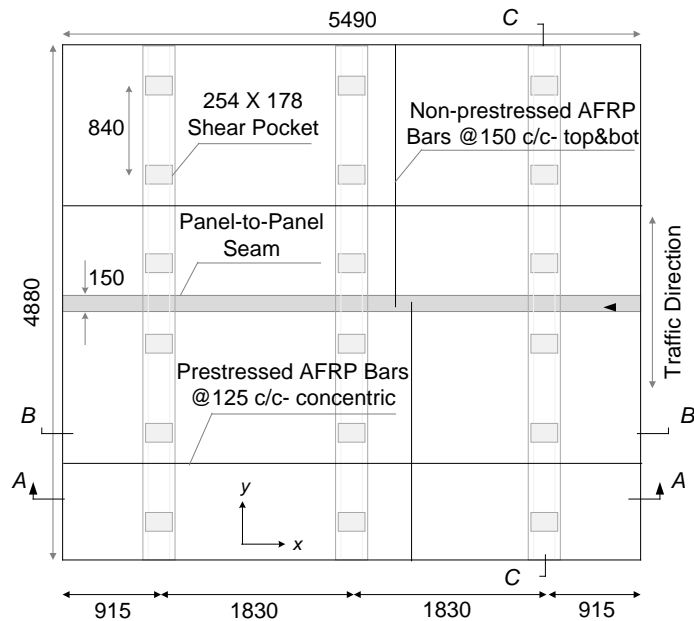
AFRP concrete bridge deck slab with full-depth precast prestressed panels
